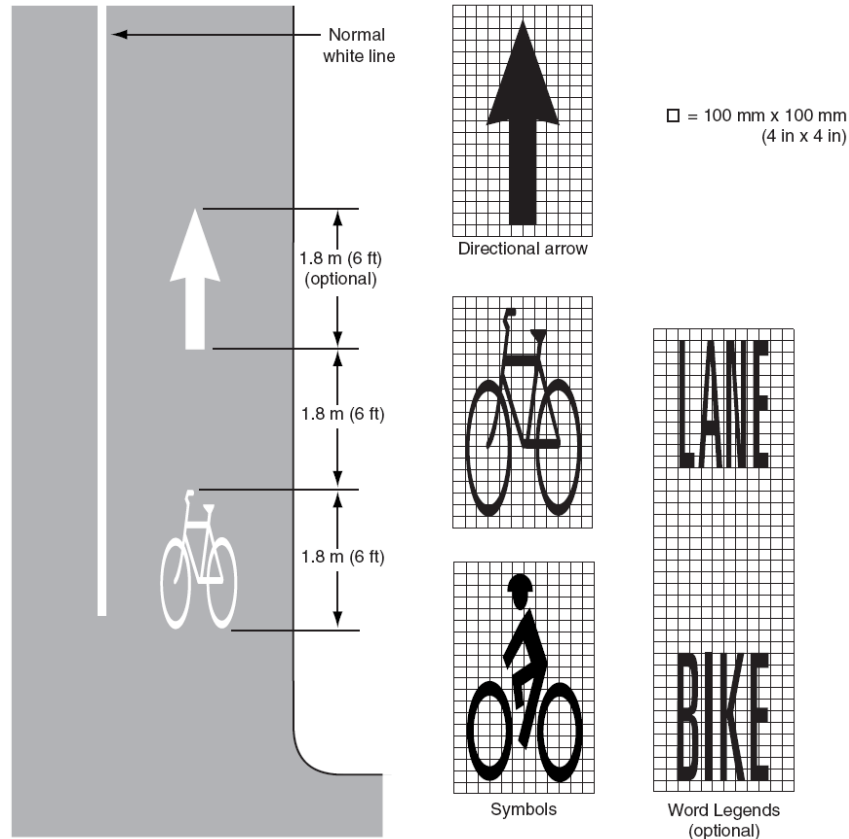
Standard Bike Lane pavement markings. (Source: MUTCD, Ch. 9).
